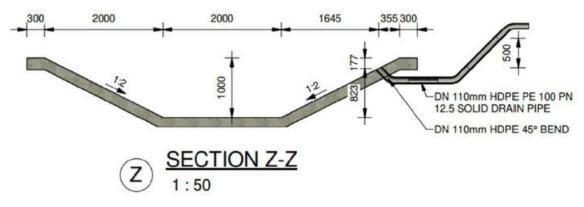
Typical Trapezoidal Concrete-lined Channel Detail (Eco Elementum, 2025)
